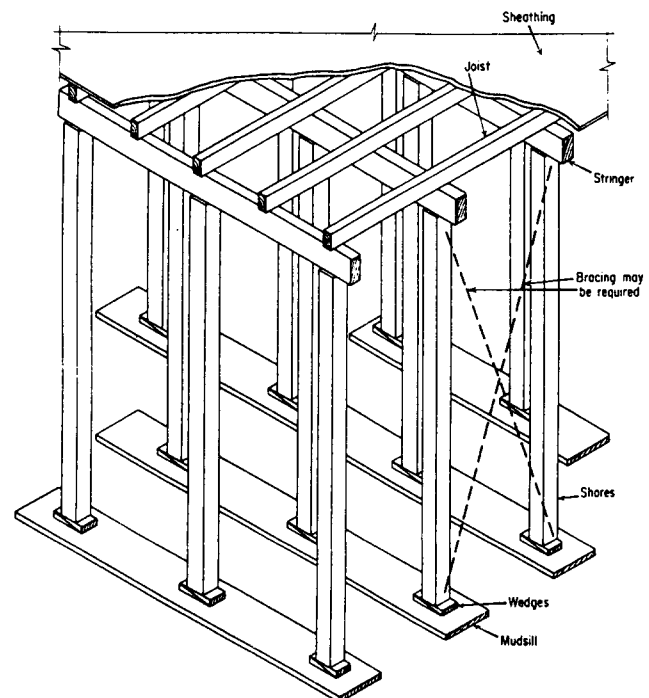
Typical Structural System for All-Wood Slab Forms (Spiegel and Limbrunner 1991)
